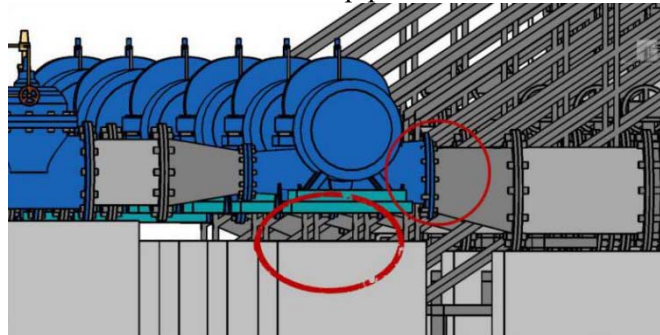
Pump elevation problems discovered by Revit 3D visual modeling
